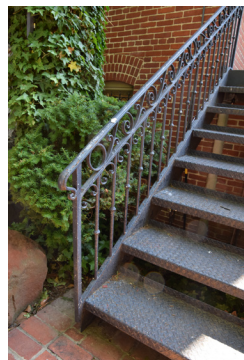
[Center] Deteriorated finish at handrail of southwest stair. [BBB, 2024]
